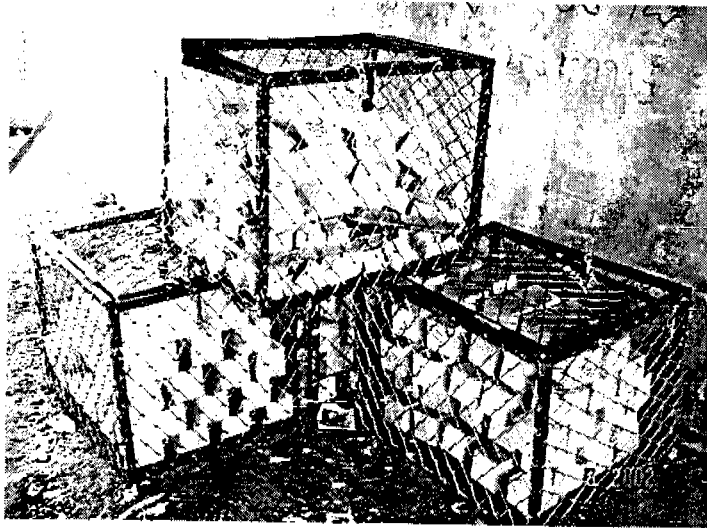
Concrete specimens in the city-sheltered conditions
